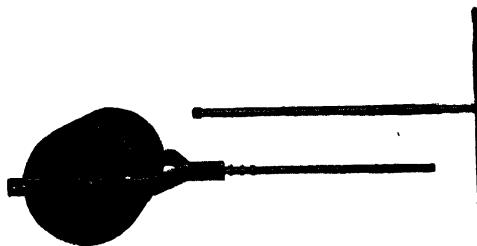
Hand Rollers Used in Laying Asphalt Pavements
